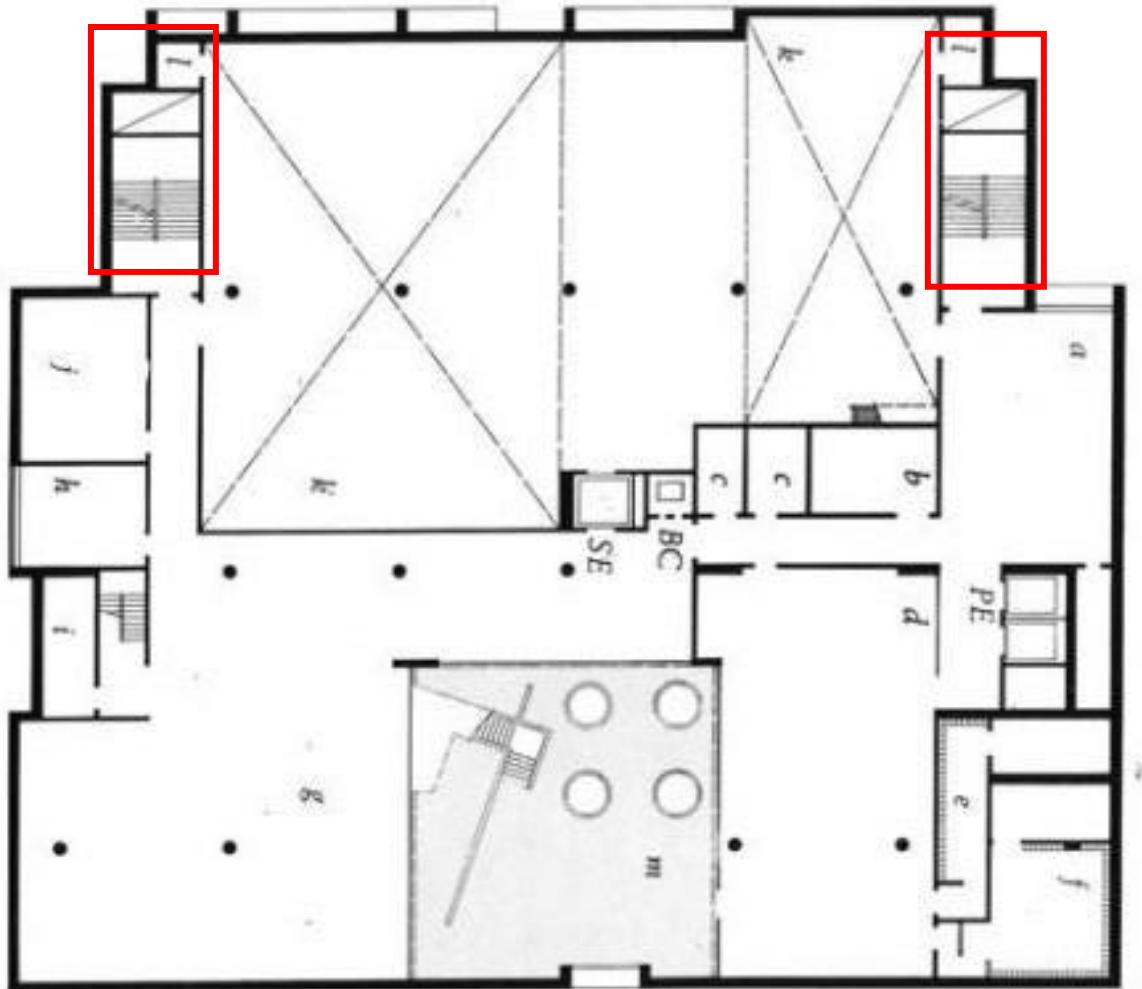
Fifth Floor Plan. Adapted from Nick Kahler via Pinterest
